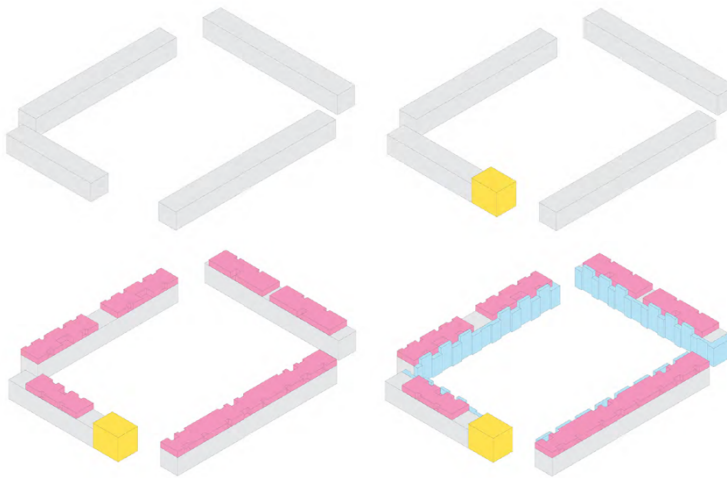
The figure shows four illustrations of how the existing buildings are planned to be renovated. The top left picture shows the four existing apartment buildings (the grey blocks). The top right picture shows how one of the apartment buildings are going to be extended with what corresponds to a staircase with associated apartments (the yellow block). The bottom left picture shows that on top of each of the four apartment buildings, there is going to be built new ‘penthouse’ apartments (the pink blocks). The bottom right picture shows how the four apartment buildings will get new balconies (the blue blocks) towards the inner garden. The grey and blue blocks represent the ‘renovation part’ of the project, while the pink and yellow blocks represent the ‘new building part.’ (The illustrations are made by the architectural company that designed the ‘conceptual design’ of the renovation project).
